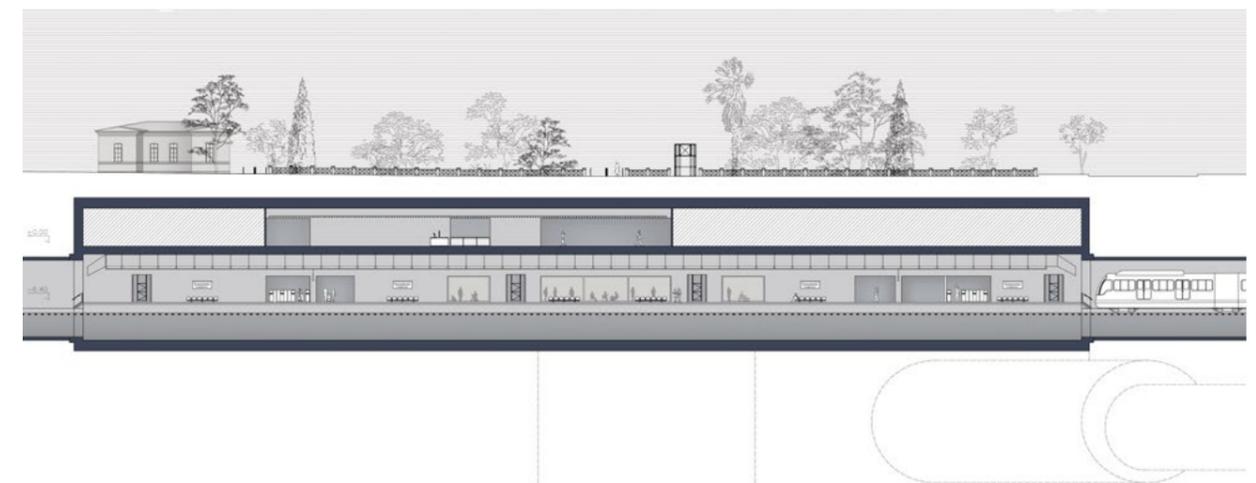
Section along the platform level, alternative proposal for the new Evangelismos station. Source: Venetsanaki Charikleia
